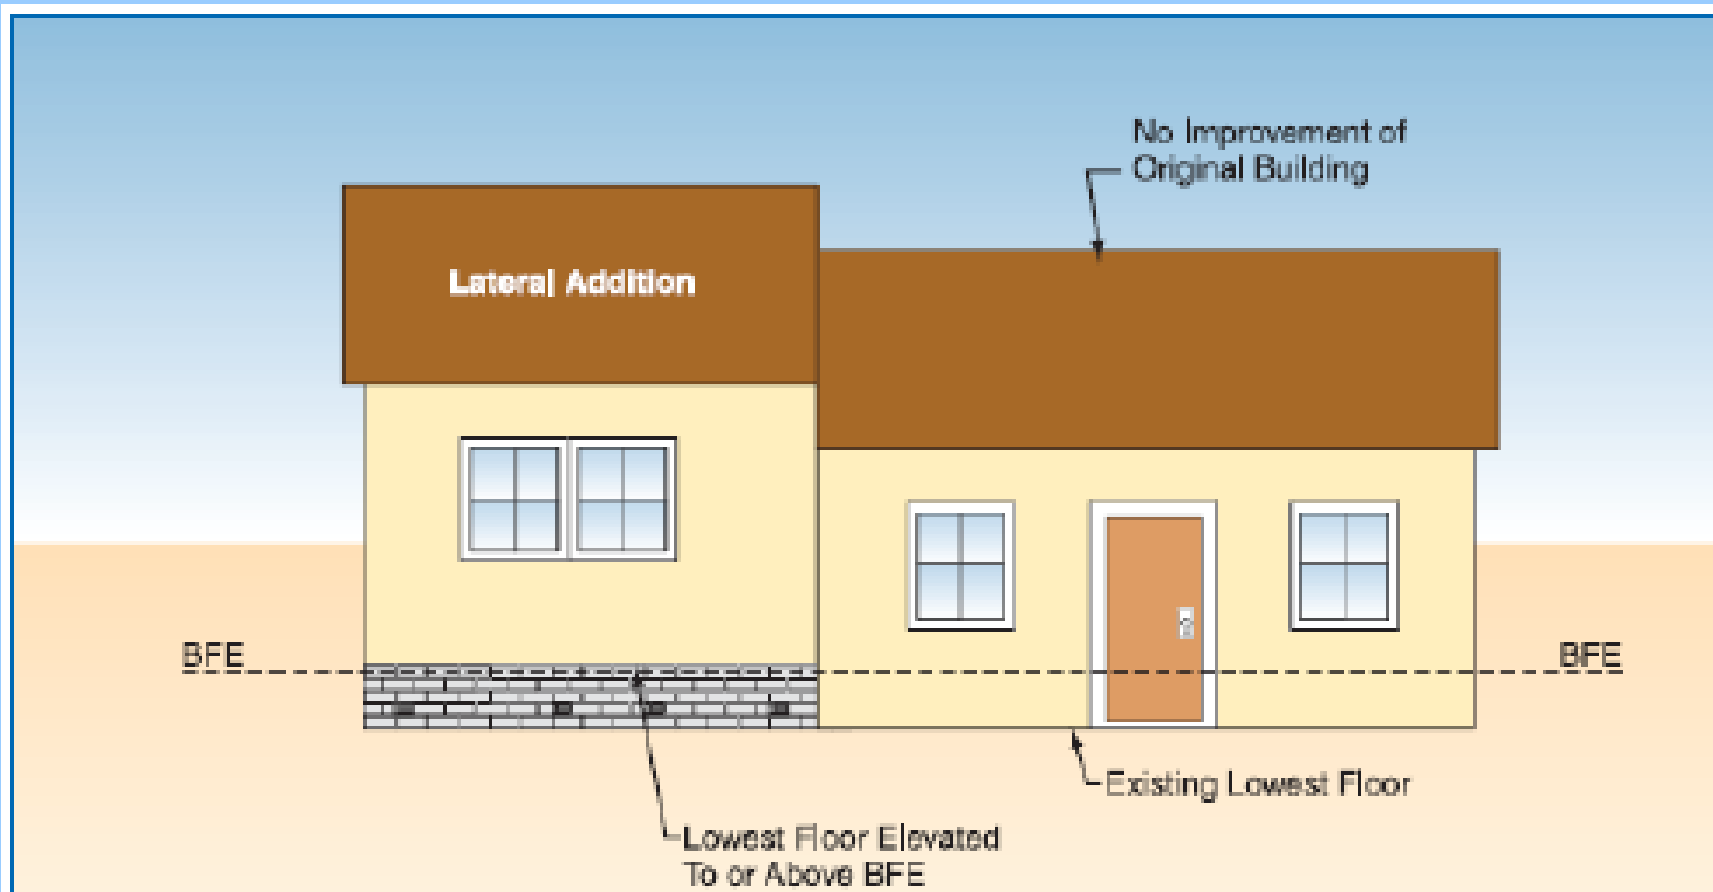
Lateral addition to a pre-FIRM building in an A zone – the proposed work is only the addition (no work was performed on the original building and no structural modification was made to the common wall or roof). The addition constitutes a substantial improvement and it complies with all NFIP requirements.
